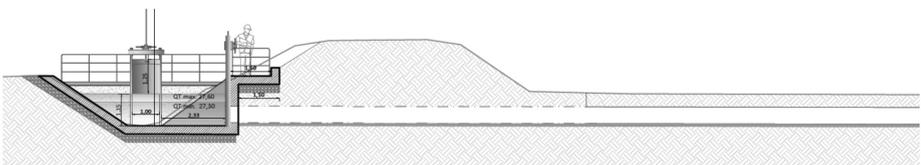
Hydraulic connection between Gaggio-Panzano canal and Canaletta A-B canal – section view PEAD pipe
